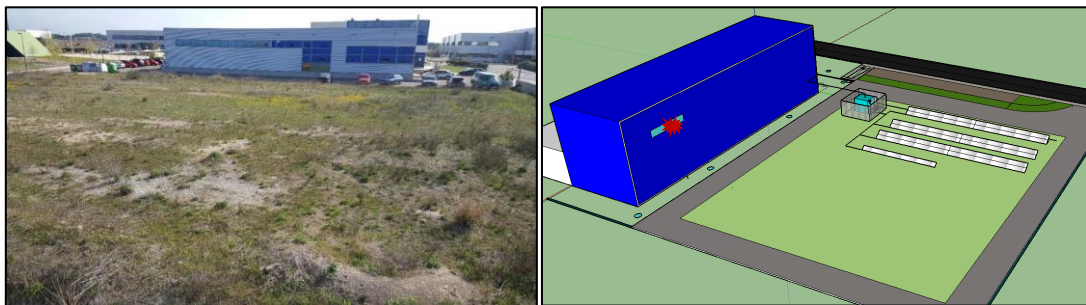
PV panels for ELY4OFF project will be built on a field next to FHA building (photo taken from FHA building )
